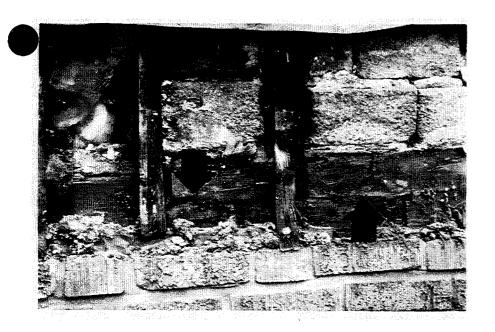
SHOUL-DER LAP AT THE 1851 COTTAGE SILL BEAM
